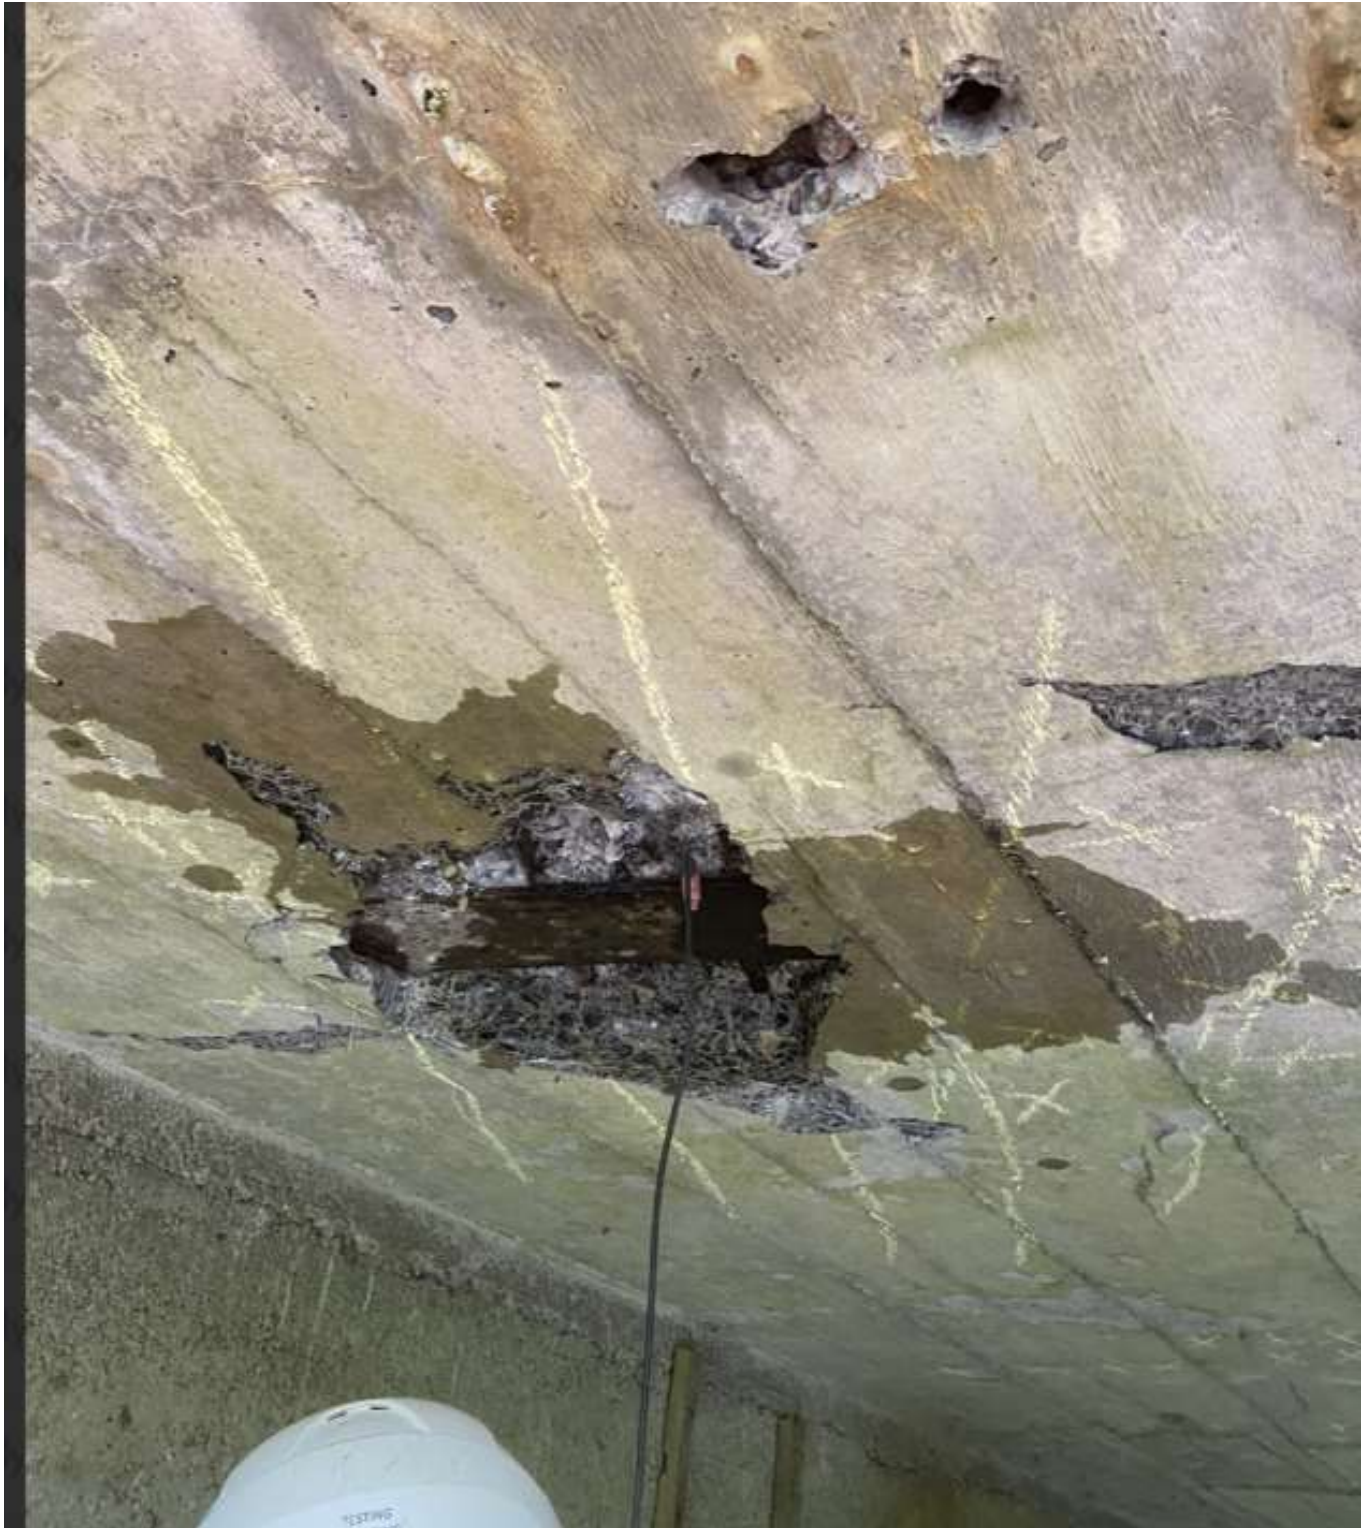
Breakout of internal beam showing transverse spacing marked via GPR
